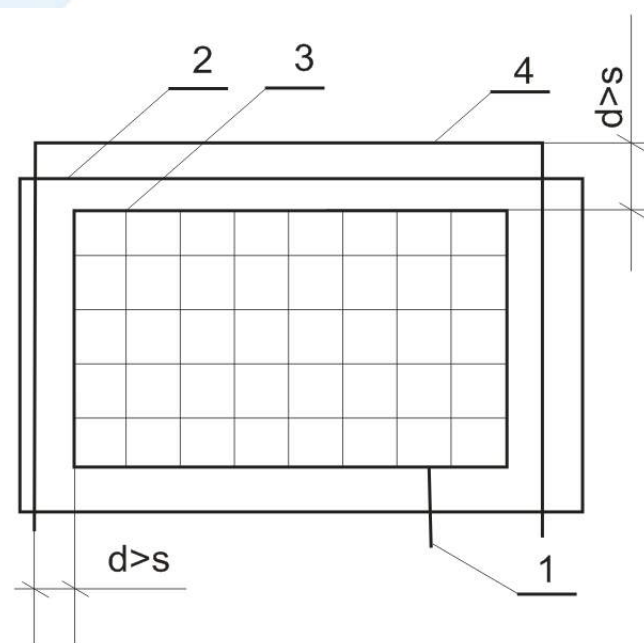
Equalising connections when  $d > s$ , where: 1 – equipotential bonding conductor to GSU, 2 – roof edge, 3 – PV generator, 4 – horizontal air terminals
